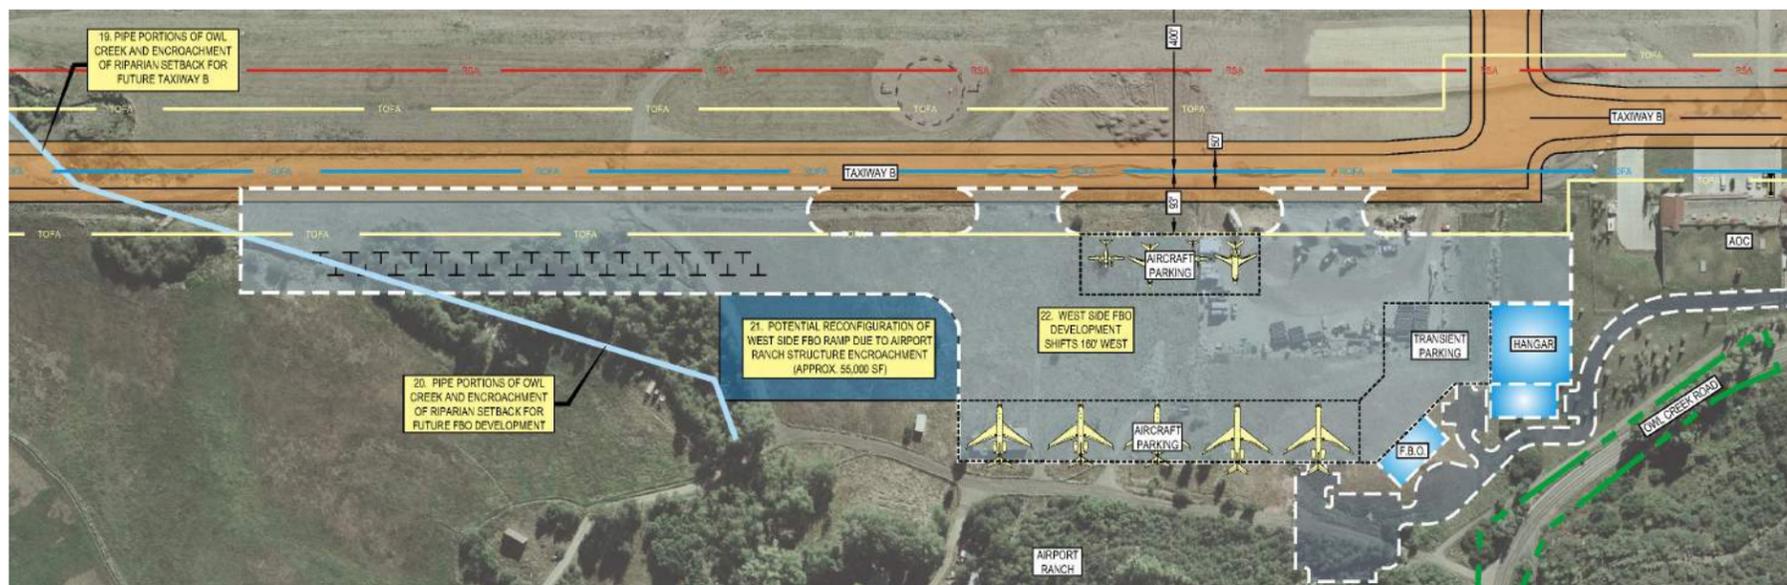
Move Master Plan West Side FBO to East Side of Airport (Appendix D, Alternative 11, Sheet 6 of 25)
